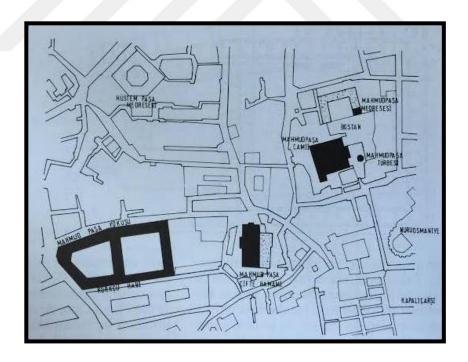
Site plan of Mahmutpaşa Külliye [6]
